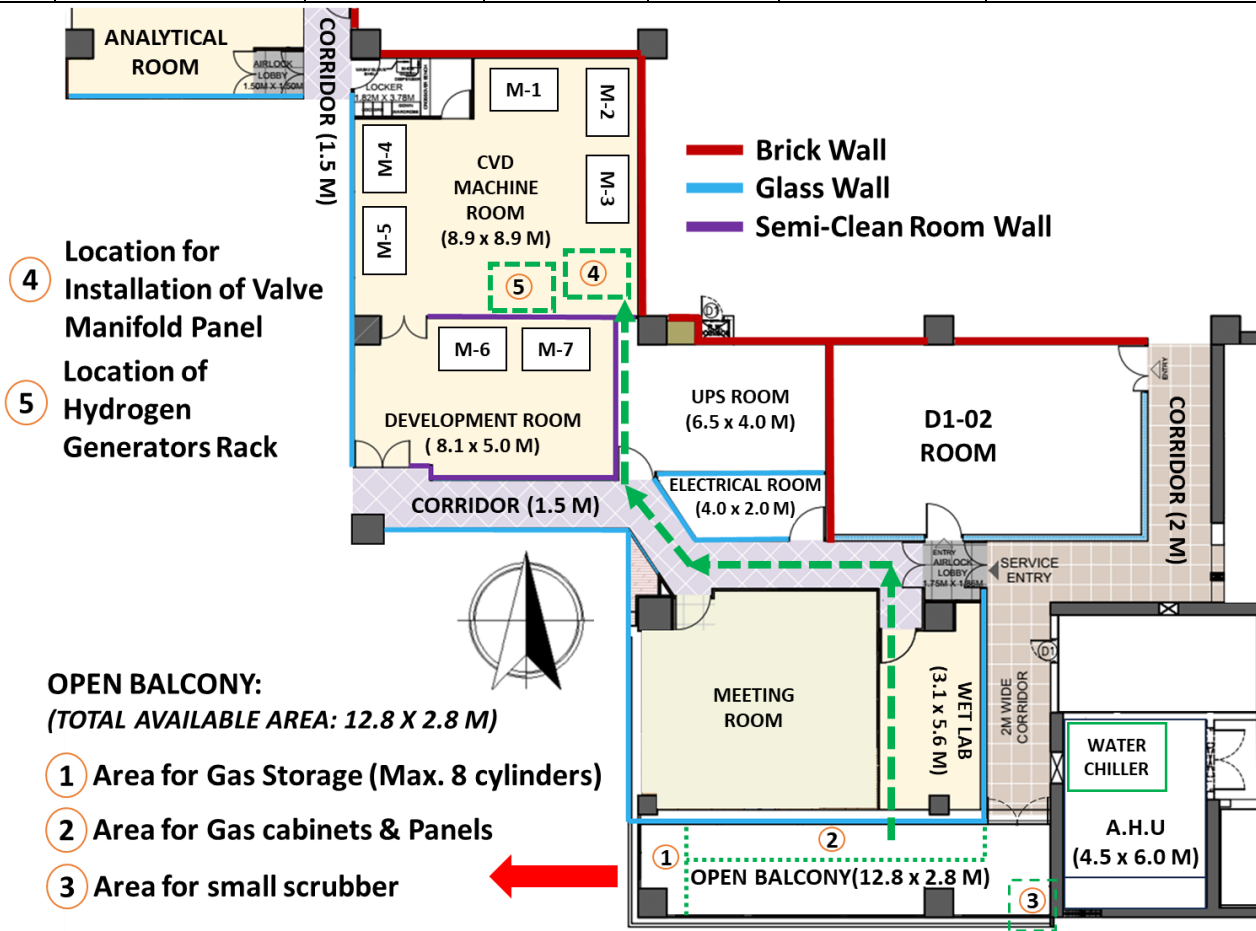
Floor plan details with preferable pathway (green arrow) for gas line construction
